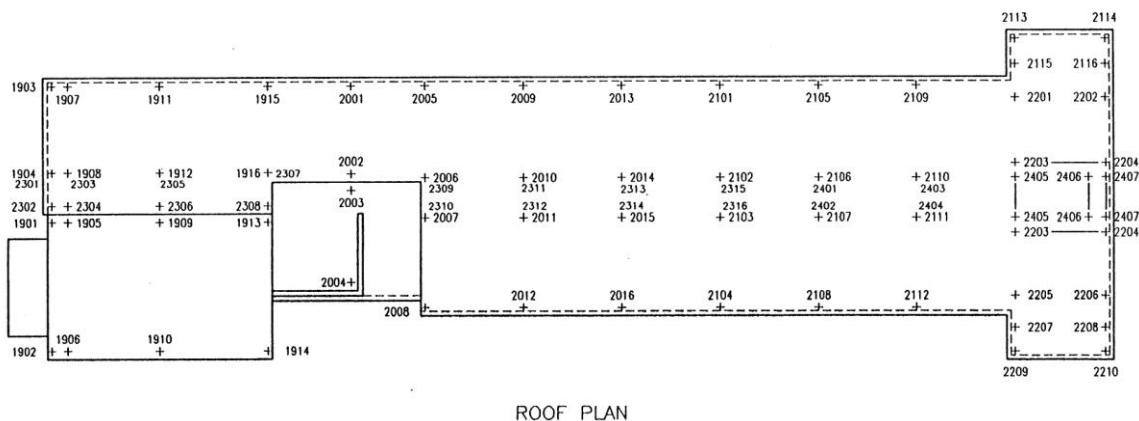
Plan View of School Showing Location of Truss Uplift Loads (North is towards top of page).
